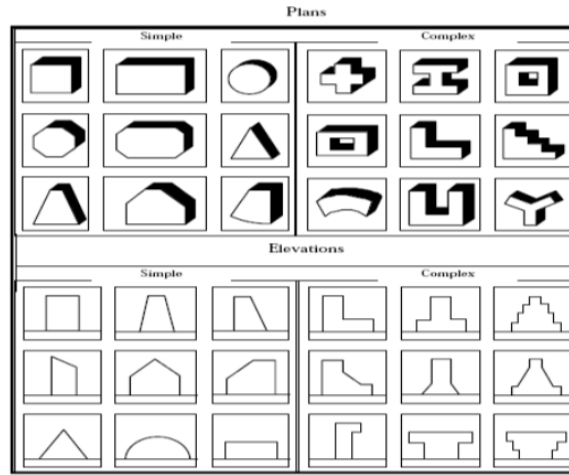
Sample of simple and complex plans and elevation configurations [25].
